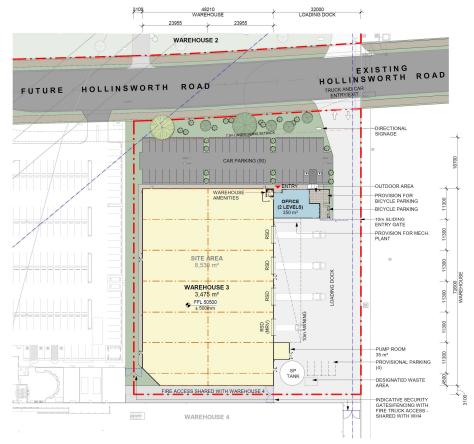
Warehouse 3 Site Plan (Source: Reid Campbell)
